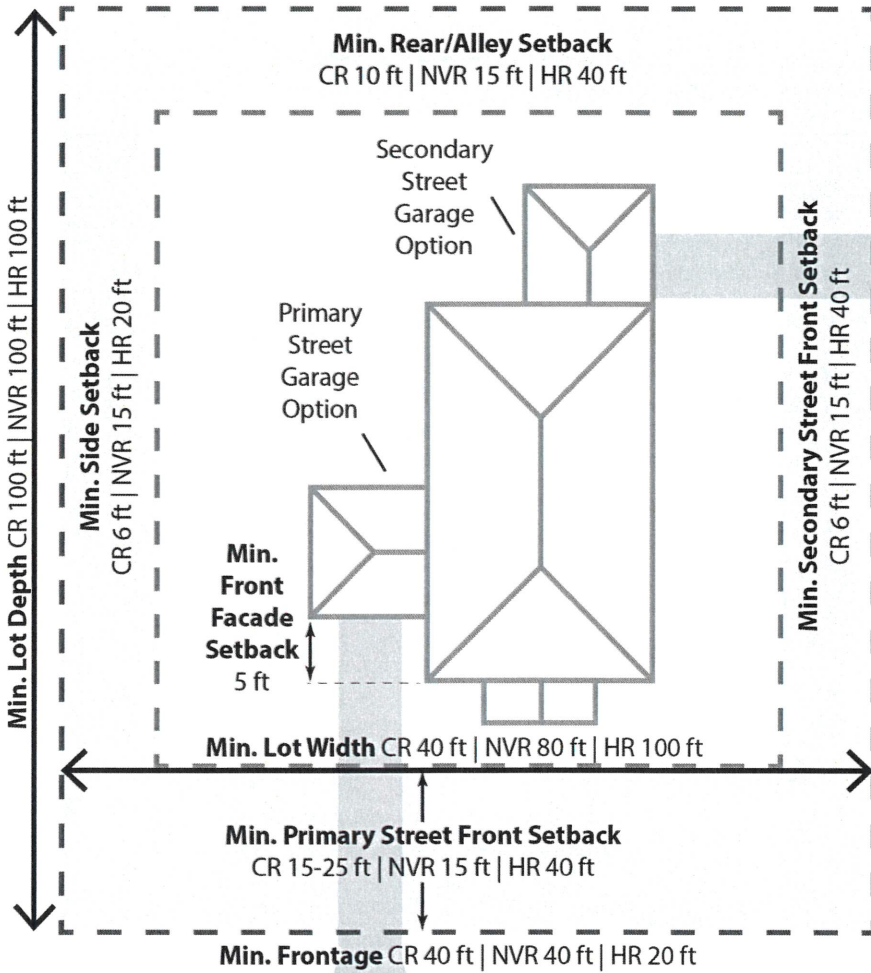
CR, NVR, and HR Spatial Requirements- Single-Family Dwellings
